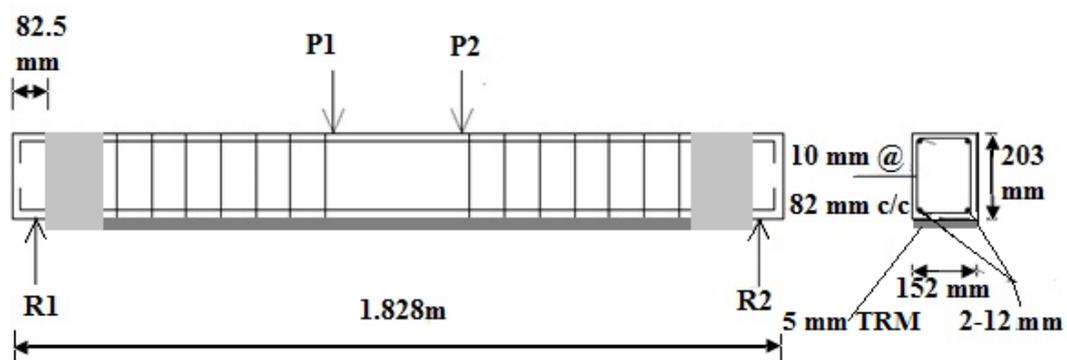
R/F details for TRM-B1 beam with anchorage a/d ratio 4.27
